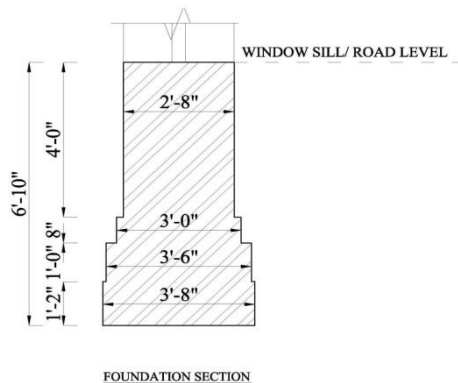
Foundation Section of Charkhal Adda at inspected locations
